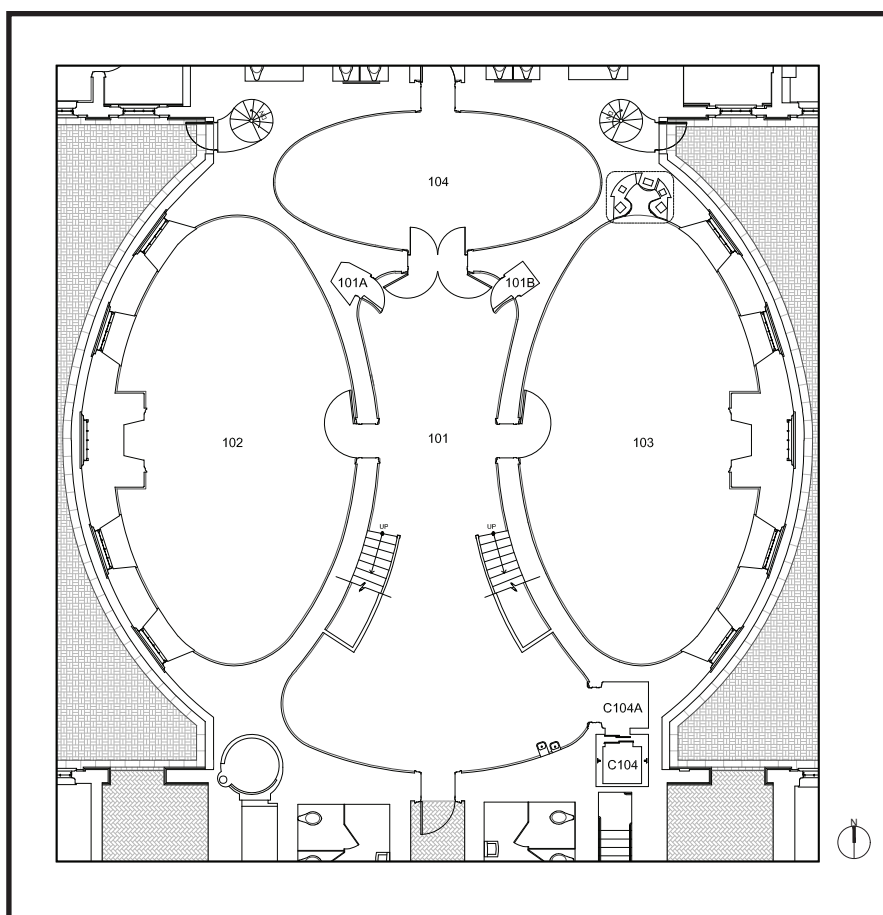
Detail, ground-floor plan of the Rotunda (not to scale).
